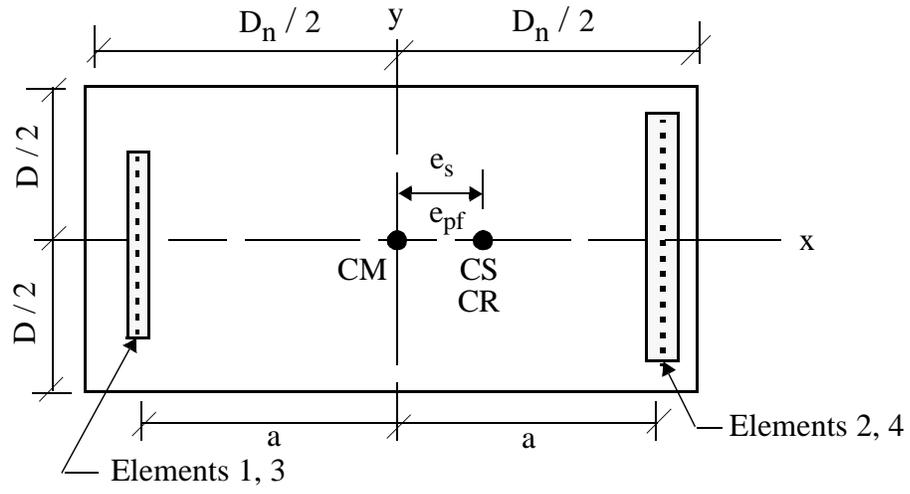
Plan layout in typical story for single and multi-story asymmetric structures.
